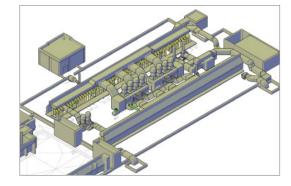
Building information model of Jordan Hall's central exhaust system.
